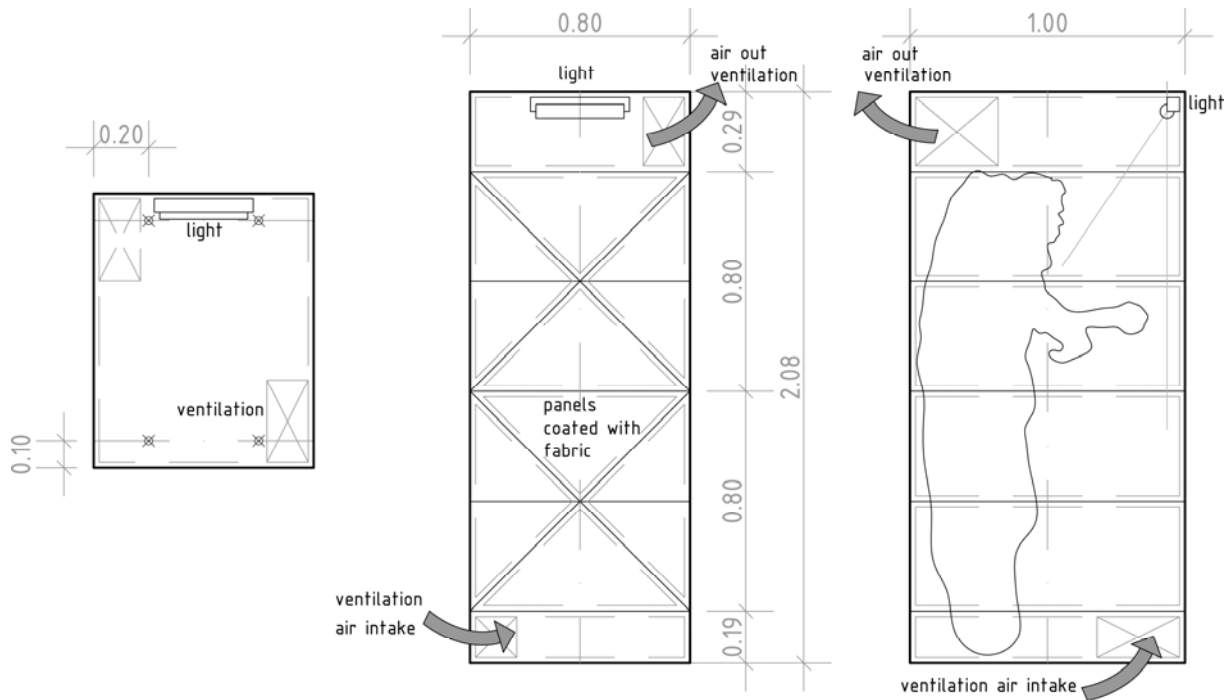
Light and Ventilation, drawing © LSG/Imhof
